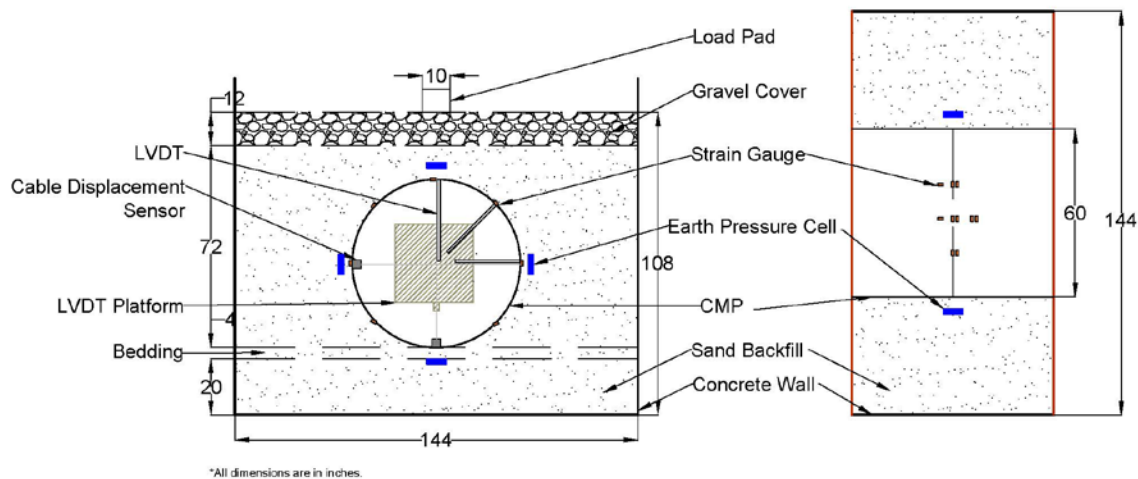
CMP test setup: cross-section (left) and plan (right) view.
